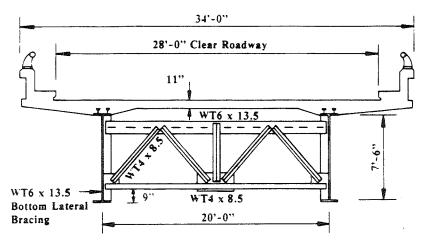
Cross section of 128-ft simple span, composite two-girder bridge (Ref. 57).
